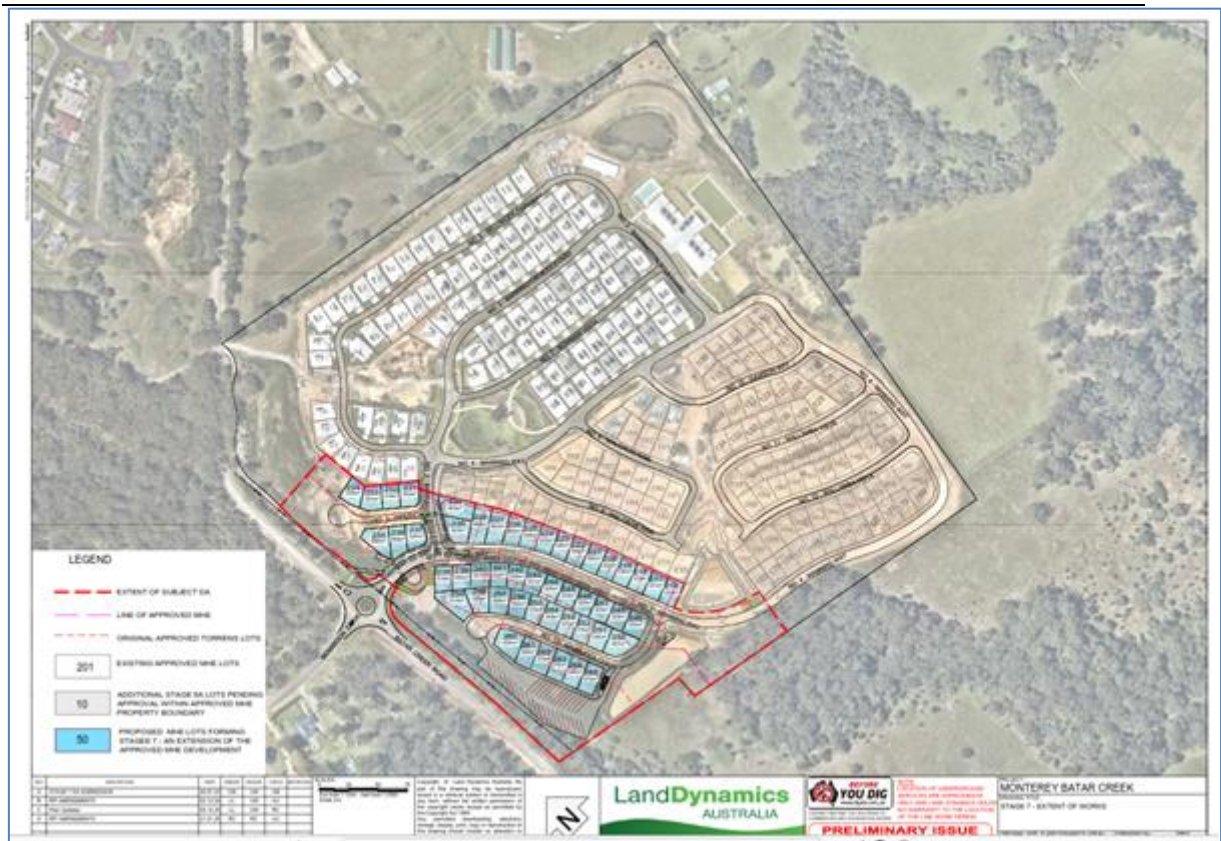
DA 2024/249 - Proposed Plans for an additional 50 sites.
